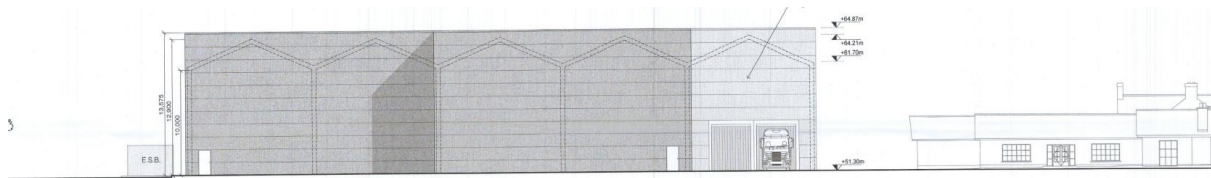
Extract of proposed south elevation of warehouse which is significantly taller than surrounding dwellings.
